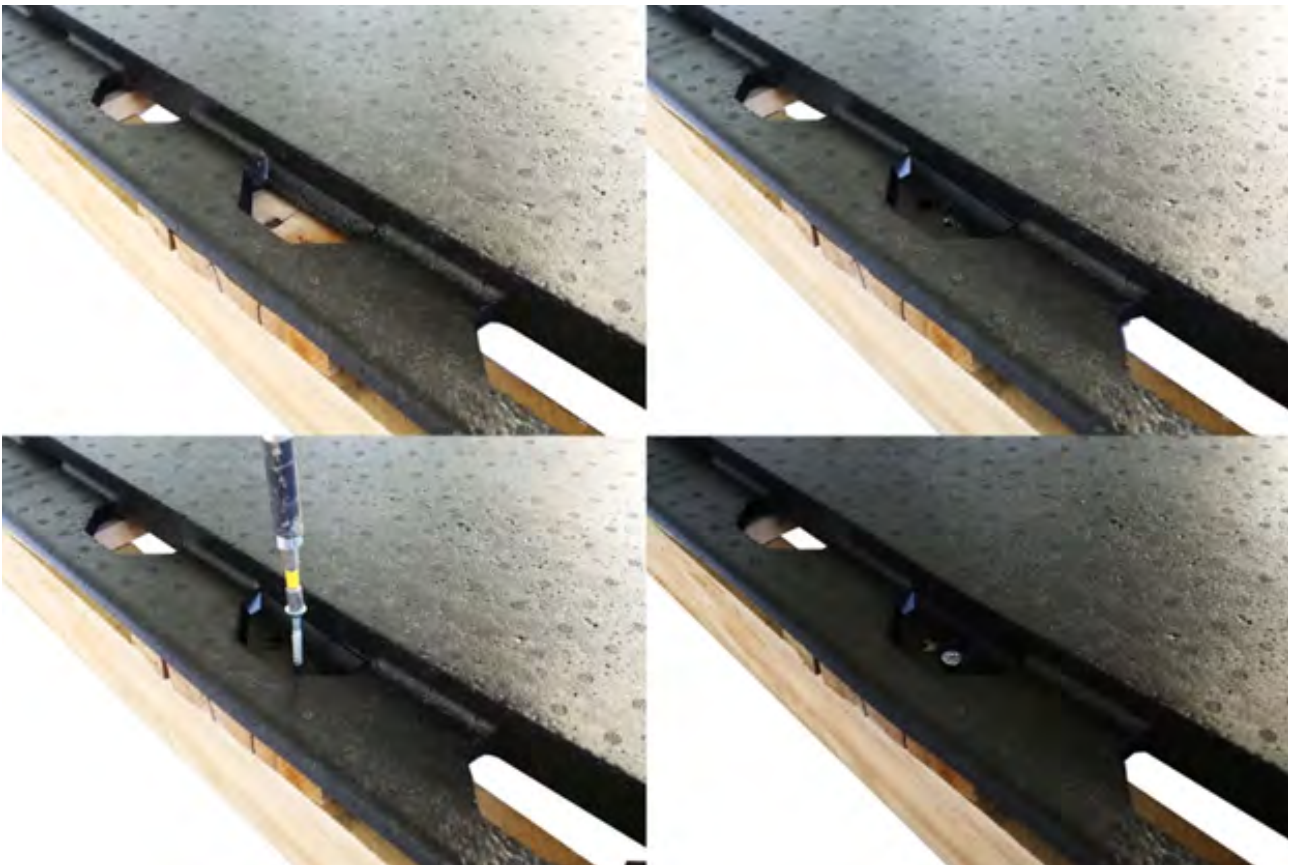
Installation of an Emergency Floor tile onto a wooden shipping pallet
